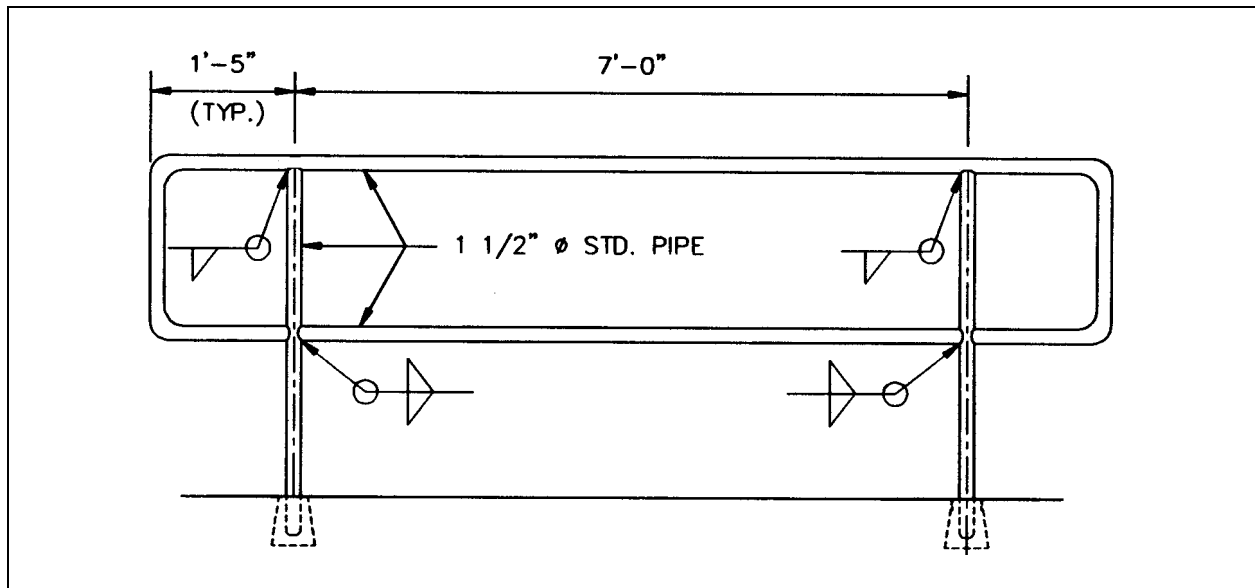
Steel handrail schematic (1 in. = 2.54 cm; 1 ft = 0.3 m)
